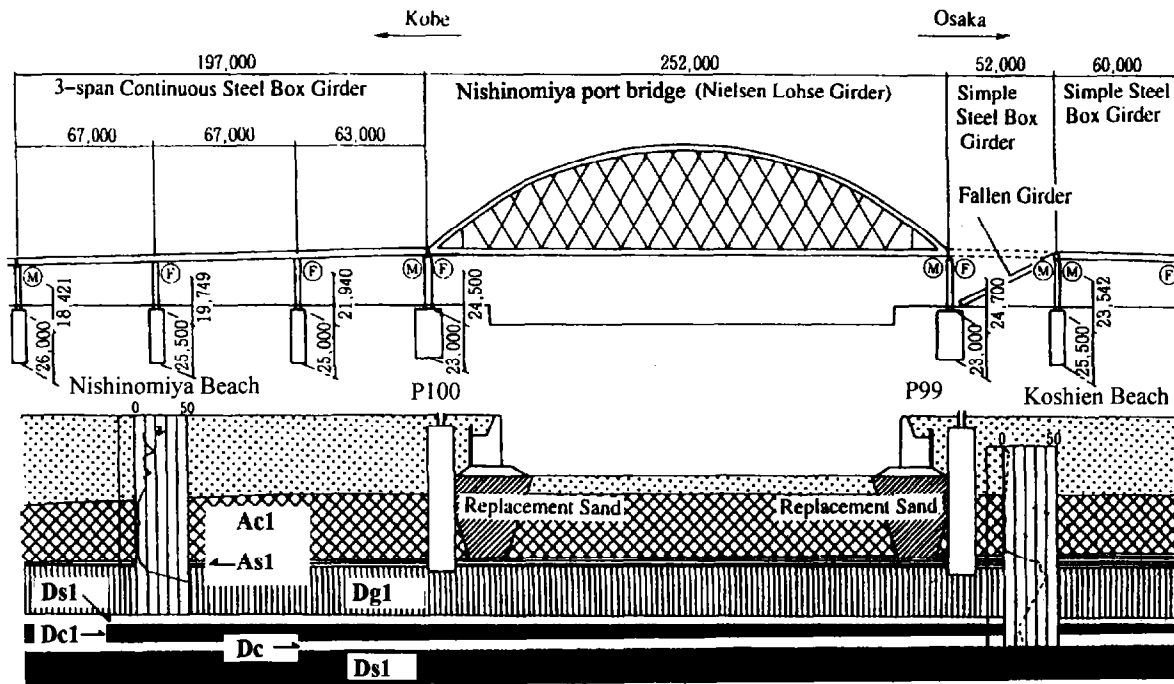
Cross-section of Nishinomiya Bridge and foundation soil.
